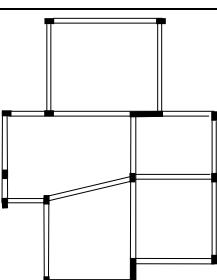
the existing column can restrict the horizontal extension in building scale
